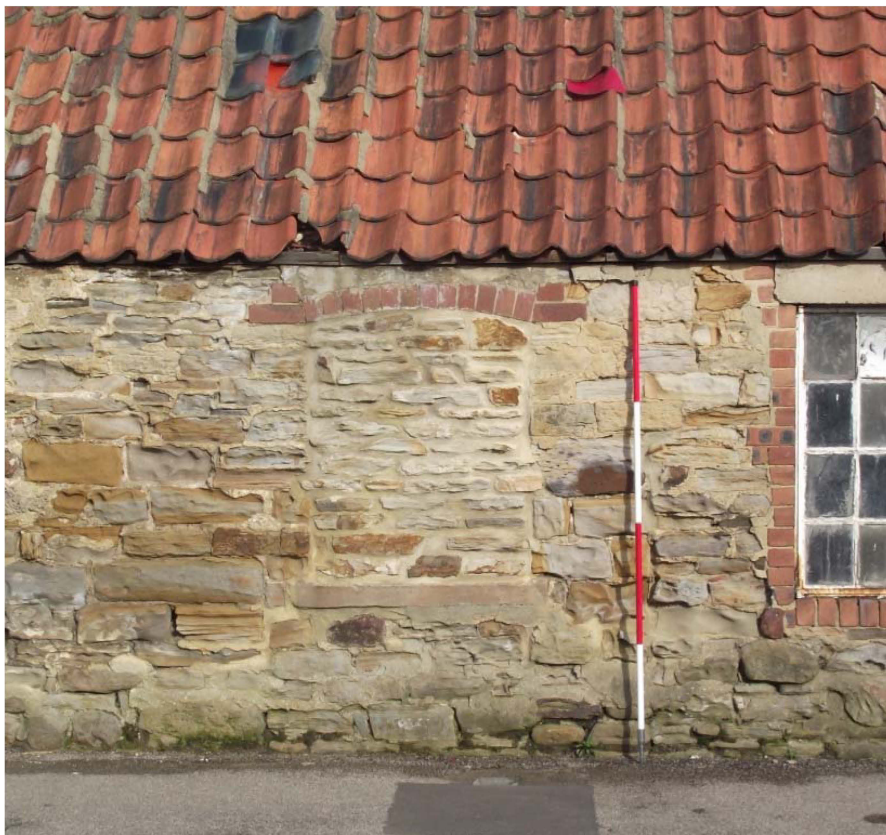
South range, south-west facing elevation, oblique view (2m scale)
